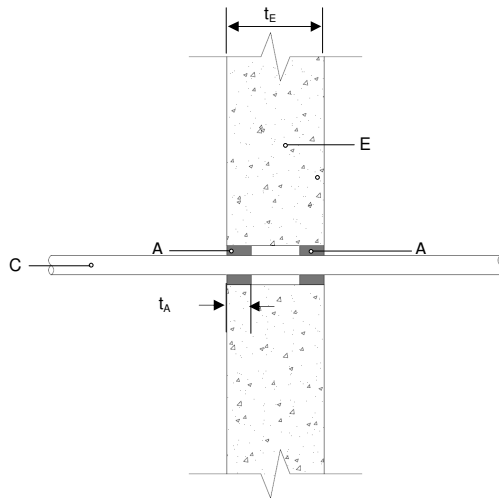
(a) - Details for PE-X Pipes in Rigid Walls greater than 100mm thick
